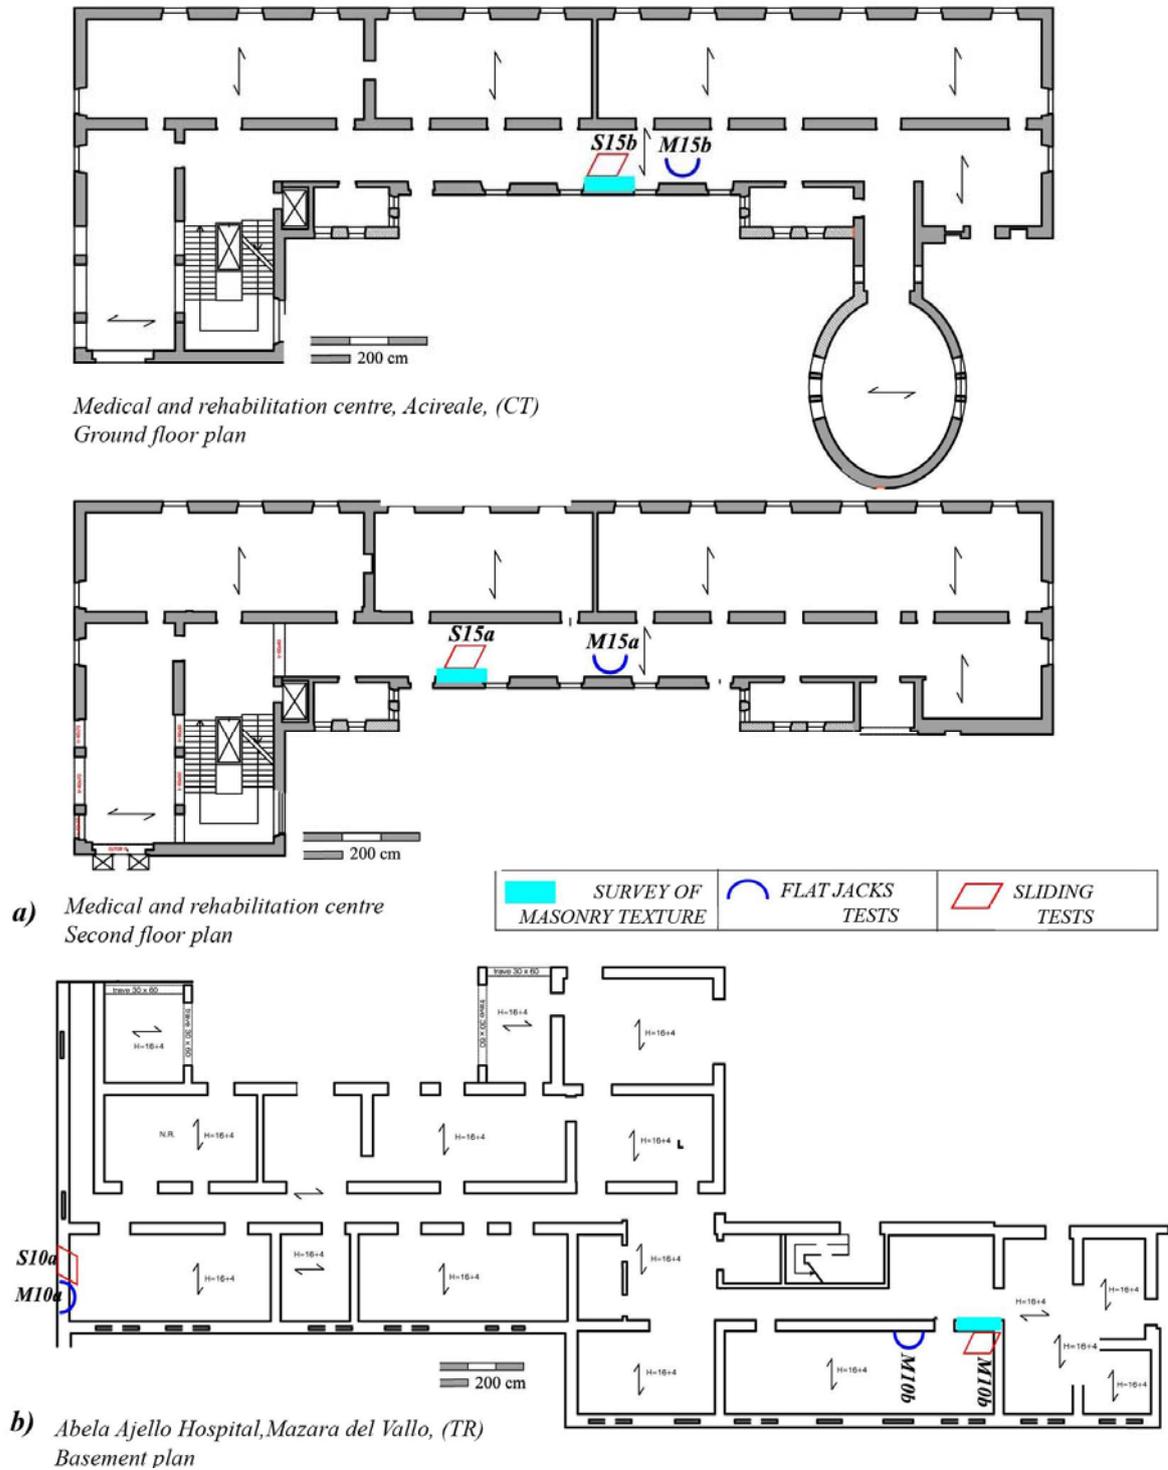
Example of location of on-site tests. The samples may be on different floors of the building in the case of the same masonry type on two different levels (a), or alternatively there may be a central wall and a side wall in the case of differing masonry types on different levels (b). Slide tests are indicated with code SiA and SiB; flat jacks tests with code MiA and MiB, where -i is the number of sample.
